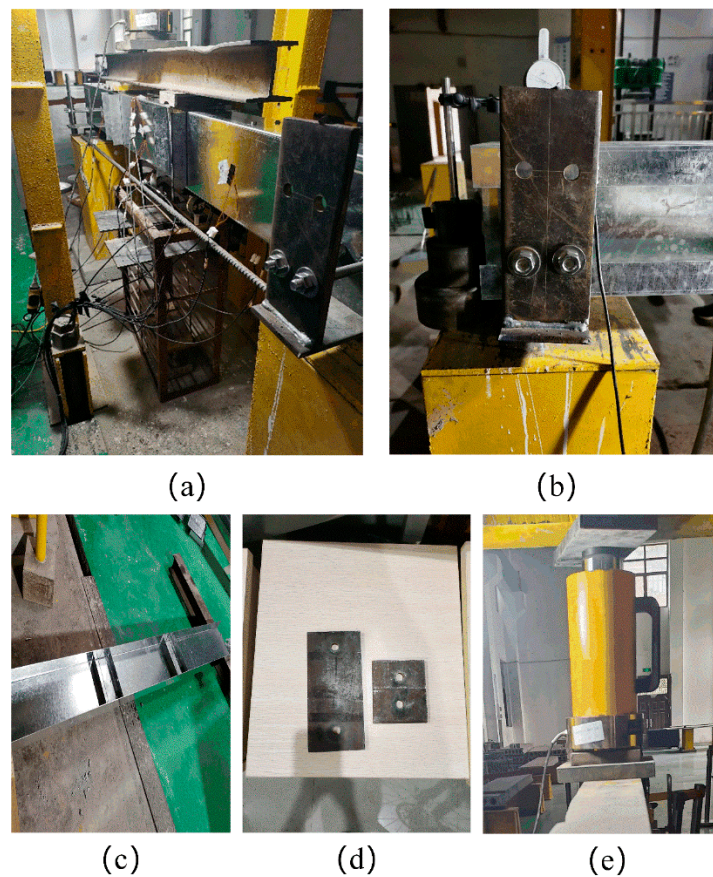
Test setup for B4 beam. (a) Overall view; (b) Fixture; (c) Reinforcement components; (d) Load transfer plates with holes; (e) Hydraulic jack and load cell.
